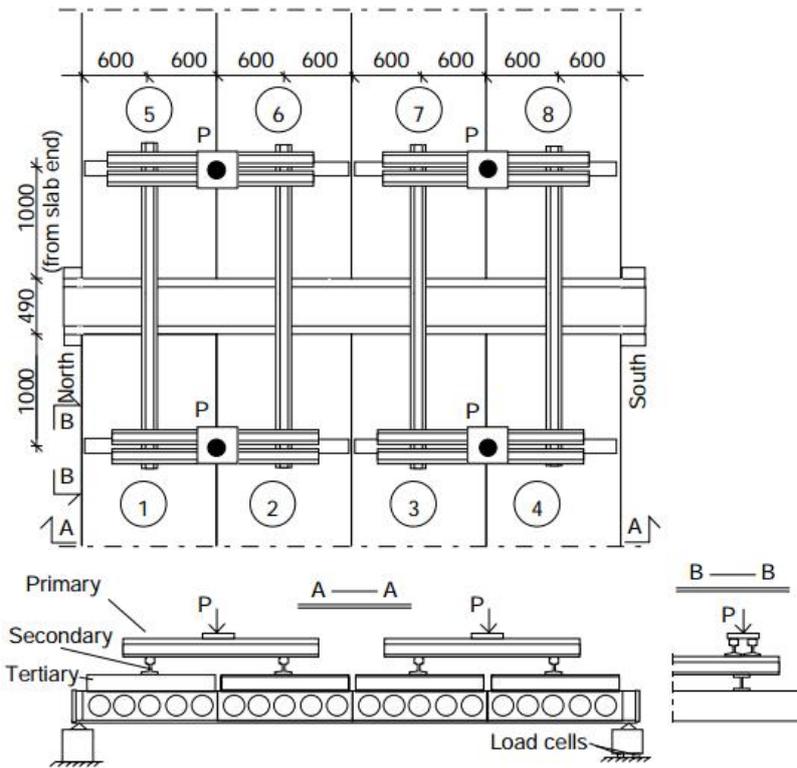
Test scheme (Finnish shear tests on floors in 1990–2006)
